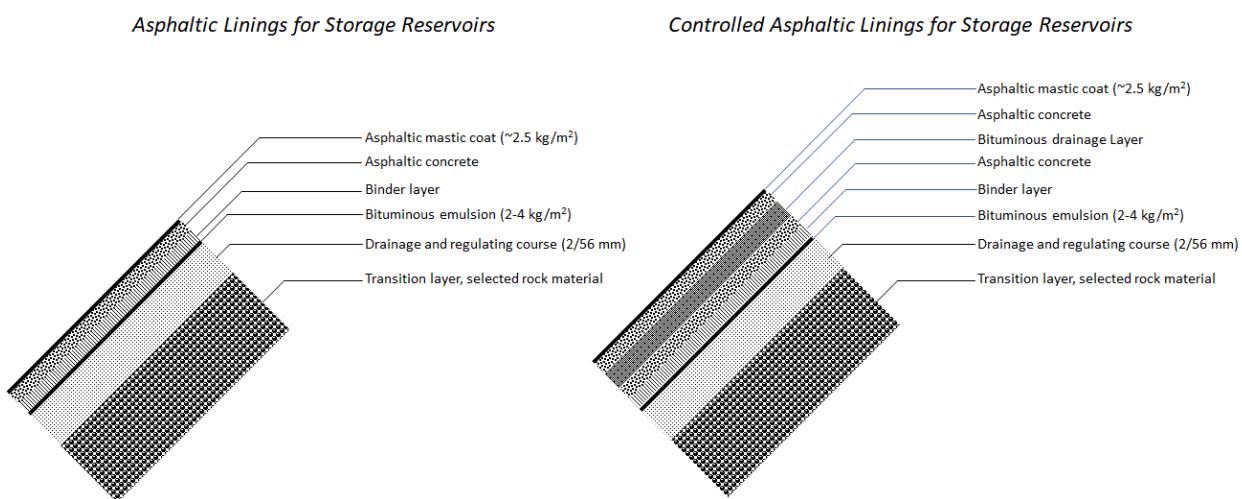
Standard Designs of Asphaltic Concrete Linings for Reservoirs (Geiseler, 1996).
